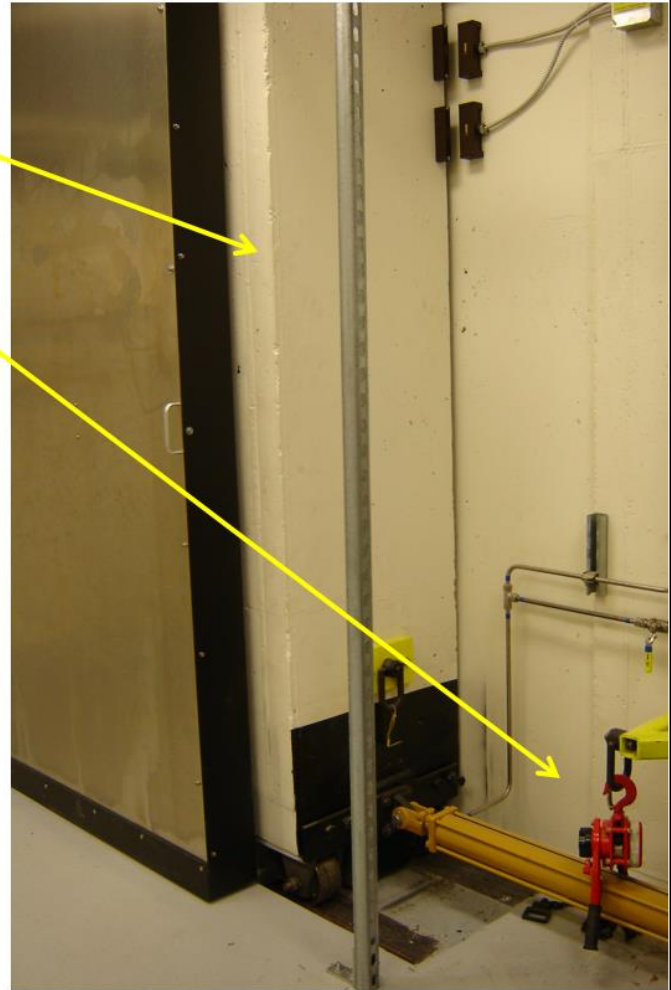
Detail showing the sliding concrete door and the sliding steel door from within the GTS enclosure.
